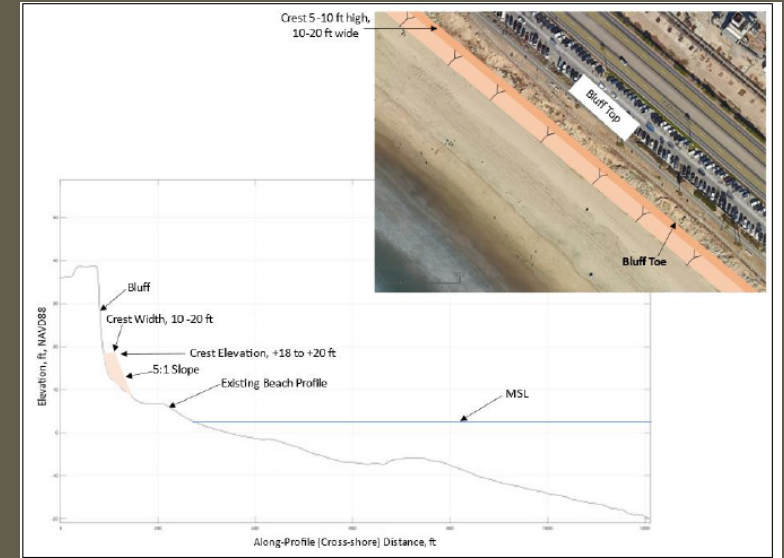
Backbeach Bluff/Cliff Stabilization Design Plan View and Cross Section
